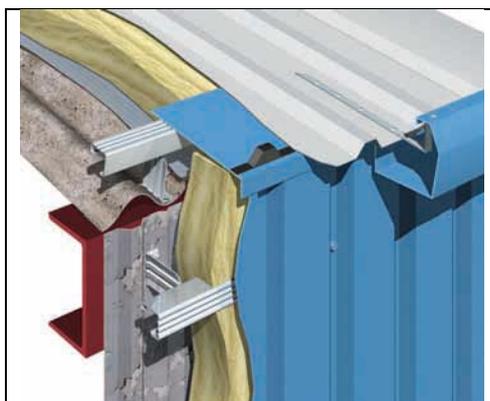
Build up system showing over roofing and wall over cladding of asbestos sheet
